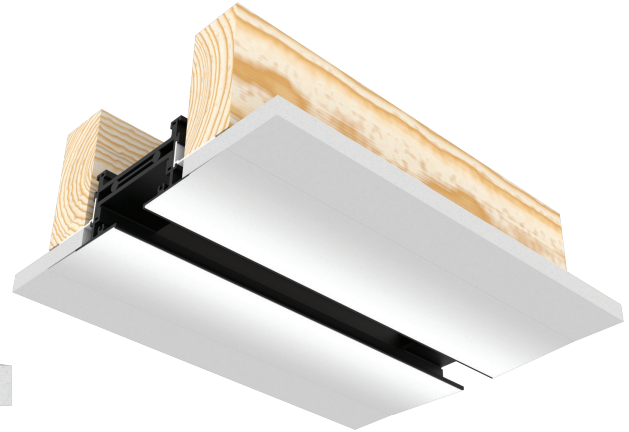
(Step 5A): Install Drywall – Tape and Spackle Border (C)
